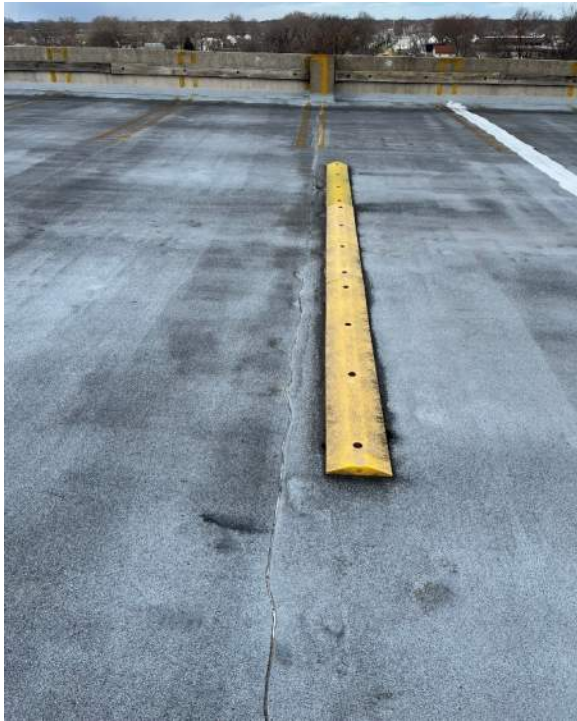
Typical condition of epoxy overlay. Failed sealant at T to T joint crack.
